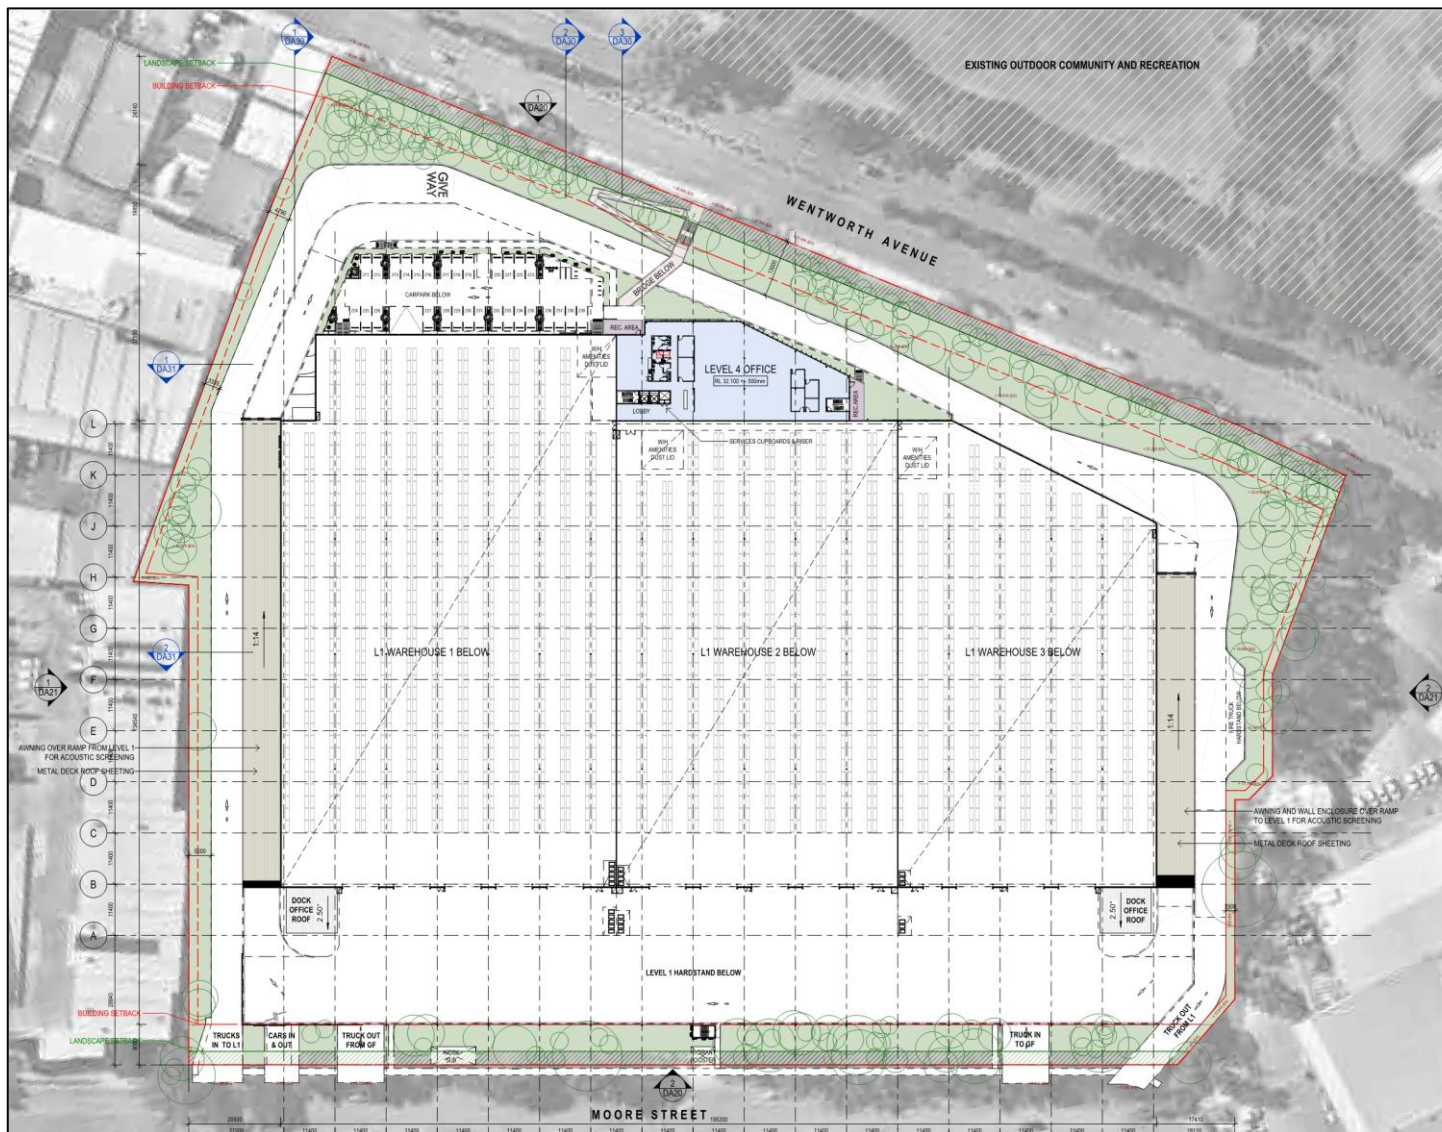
Level 4 Floor Plan (Nettletontribe Architects, 2024)
